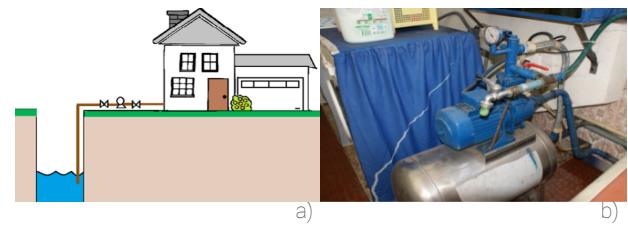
Scheme of a water supply system: from a well with an external centrifugal pump to an independent house with 2 floors (a); photo of the pump that broke down and must be replaced (b) (Cerdeira, Saraiva, and Mendes, 2011)
